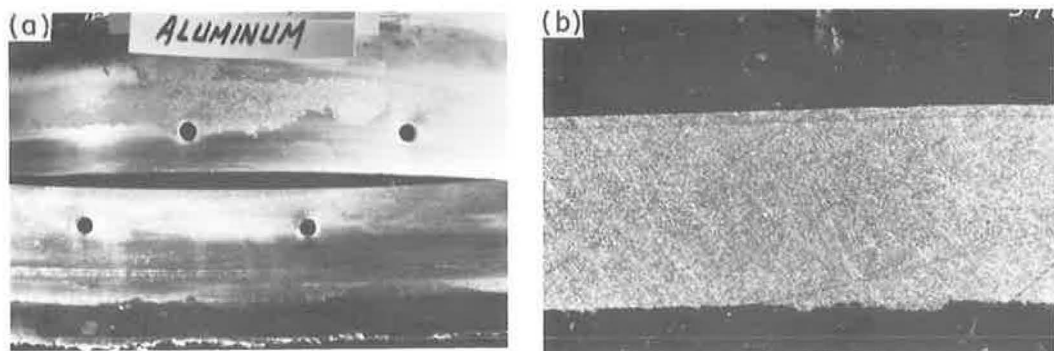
Field test site, XI-Imp-187-F, left of Sta. 498±: (a) appearance of aluminum joint after cleaning; (b) section through aluminum (note loss of cladding and penetration of base metal on soil side of aluminum culvert at bottom of photo).
